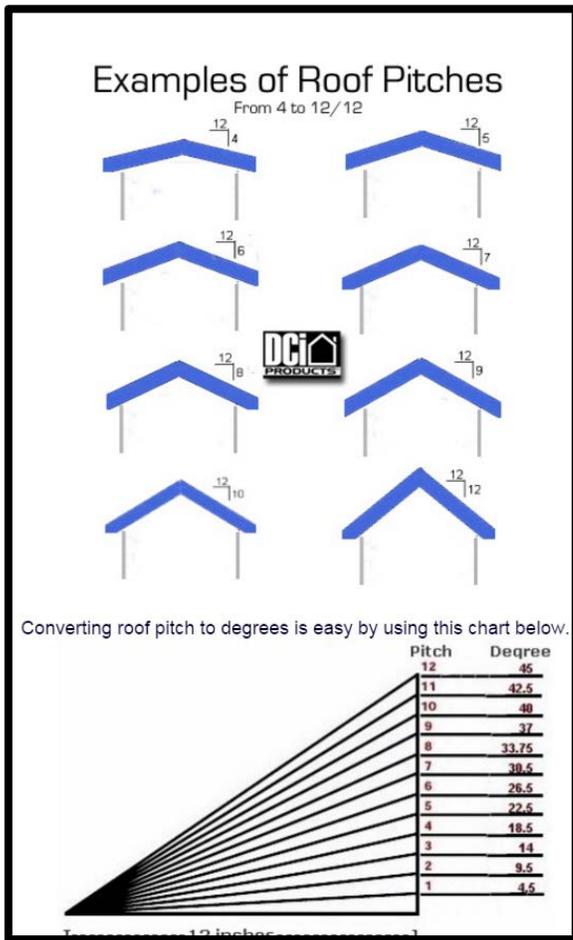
Examples of roof pitch – Staff recommends minimum pitch of 7/12 for historic outbuildings
